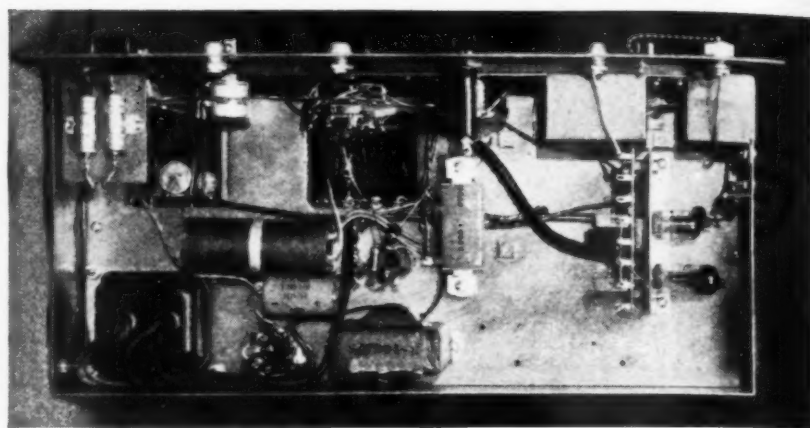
Under chassis view. Bracket containing 9006 r.f. rectifier and 6J6 mixer tubes is shown to the right of chassis. Shield cover has been removed to show a.c. line bypass condensers (top left) which suppress r.f. leakage to power cord.
